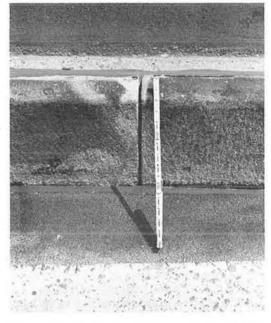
Goethals Bridge, epoxy-coal tarpatching compound installed as deck repair.
